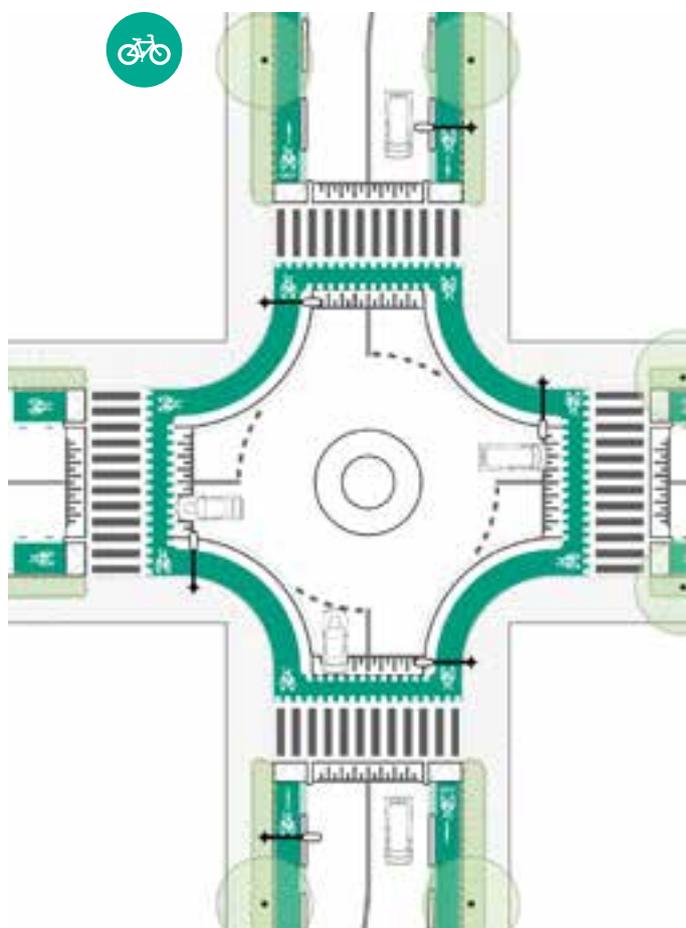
Bicycle path (one-way), separated roundabout - plan
